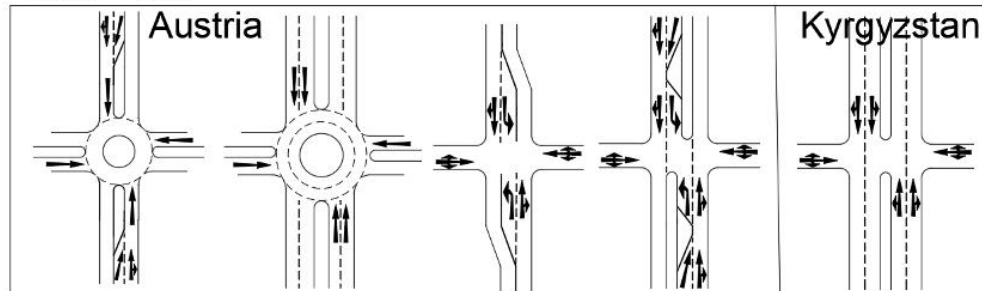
Typical intersection layouts in Austria and Kyrgyzstan
